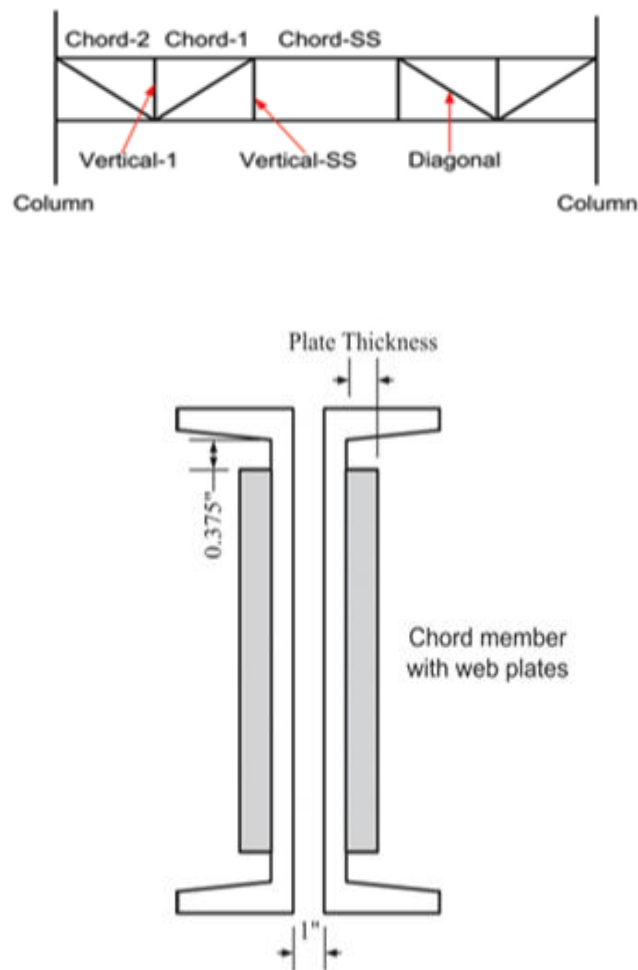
Design special segment and truss member sections for the nine-story ordinary STMF.
